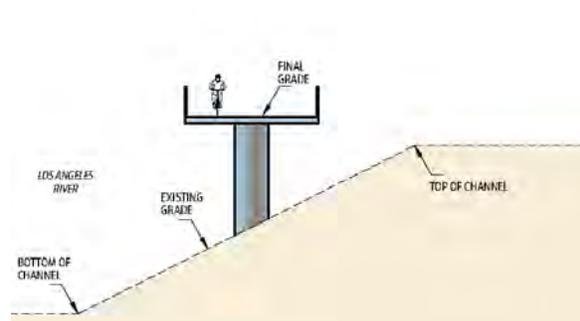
Example Cross Section of an Elevated In-channel Path Type
